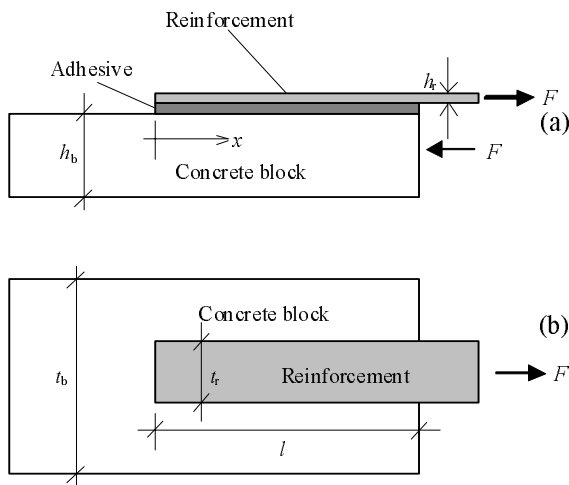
Pull-push shear test of a single lap bonded joint: (a) elevation; (b) plan.
